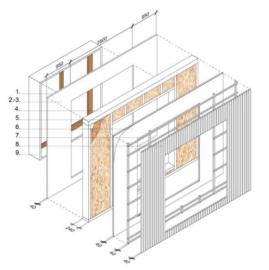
Layers of the RE⁴ CDW prefabricated timber facade element
